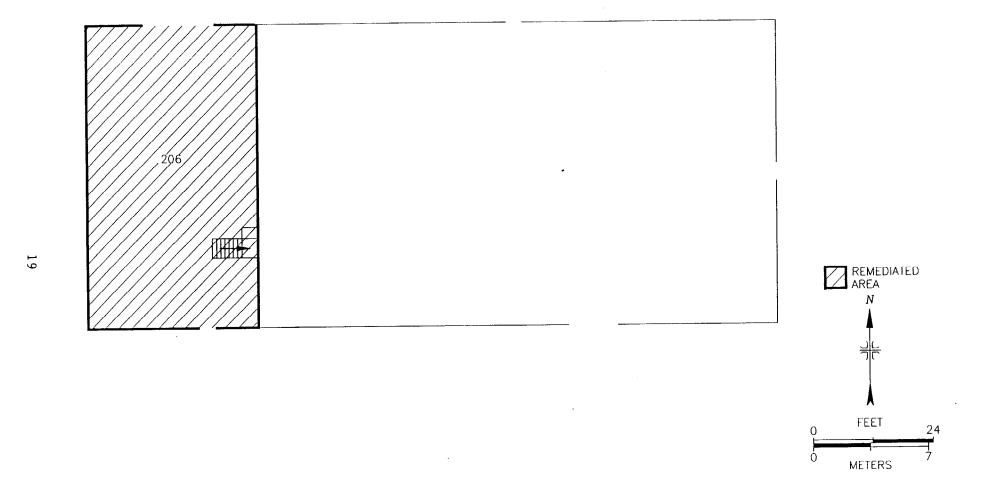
Layout of Second Floor, Building 4, Indicating Location of Remedial Action
